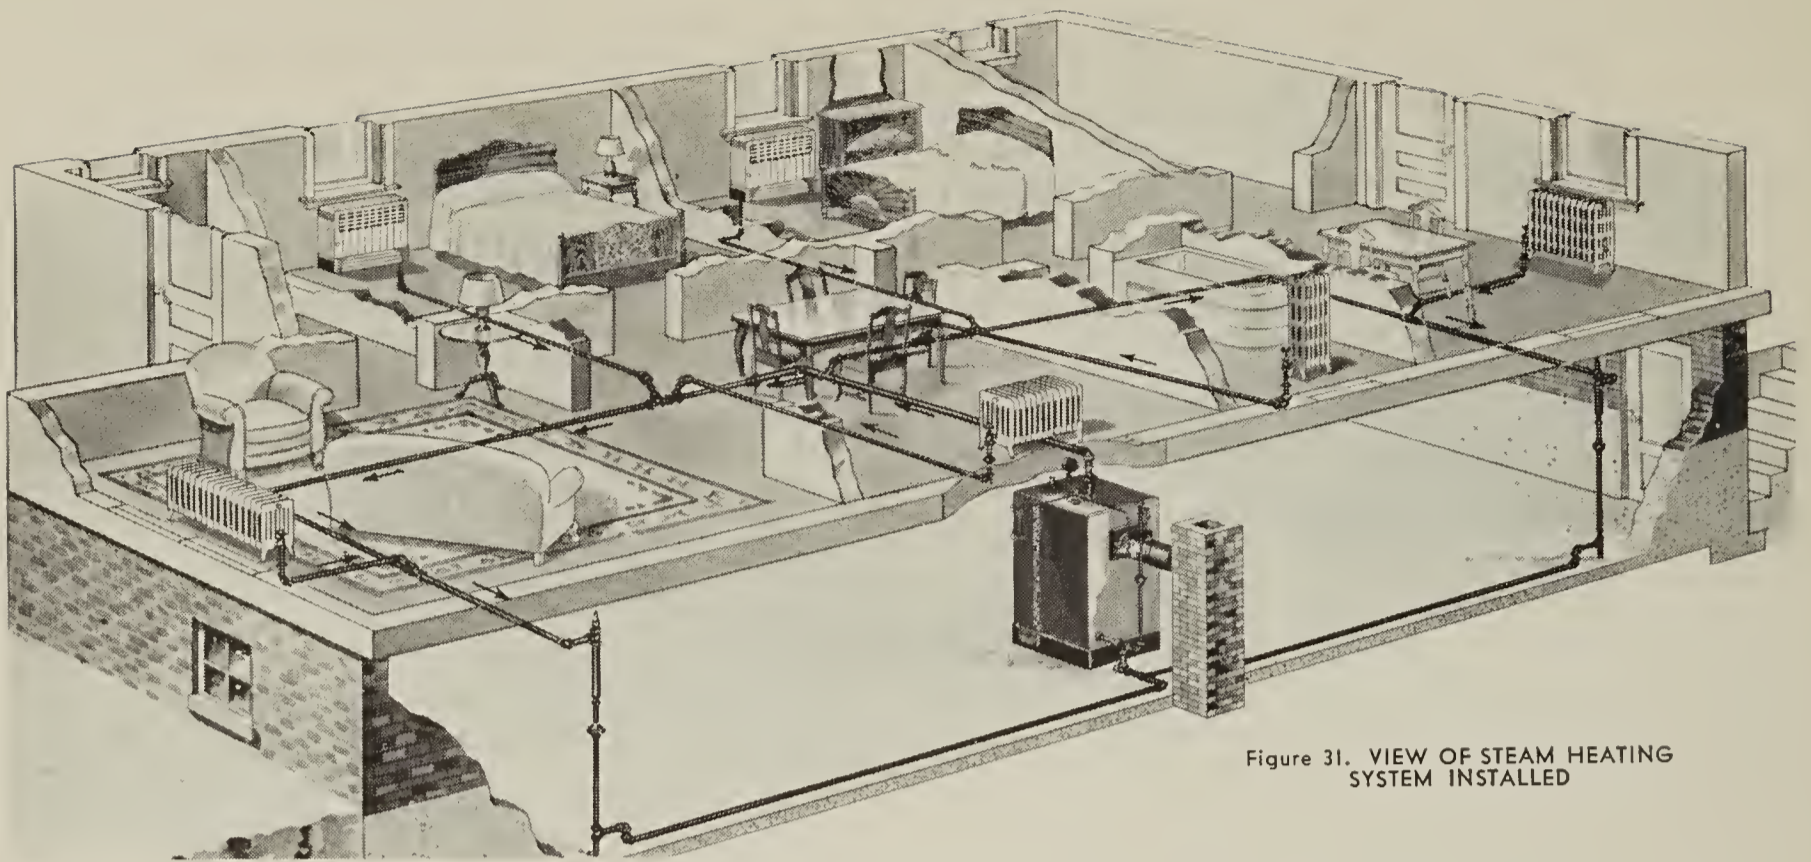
VIEW OF STEAM HEATING SYSTEM INSTALLED
